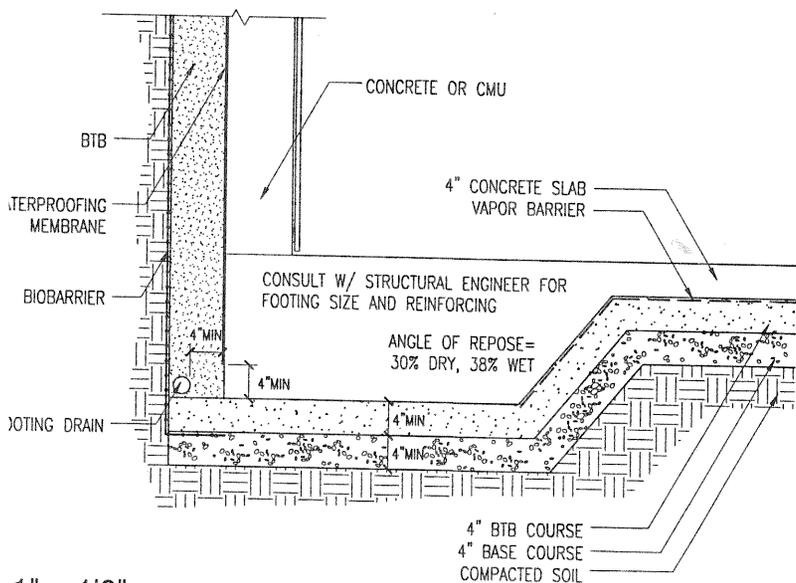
Basaltic termite barrier installed beneath a concrete driveway and garage slab.
